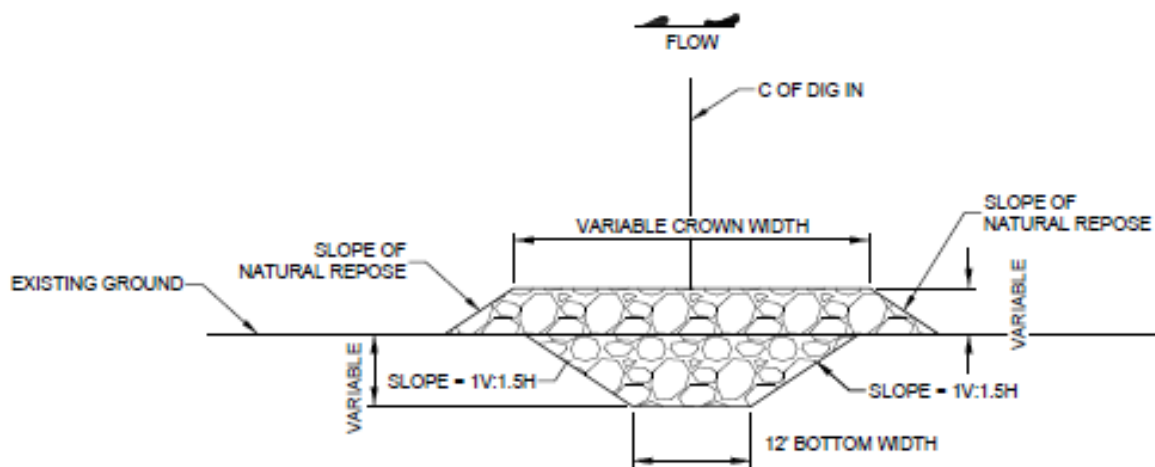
Typical Section for Transition Between Dike and Dig-In (C7)
